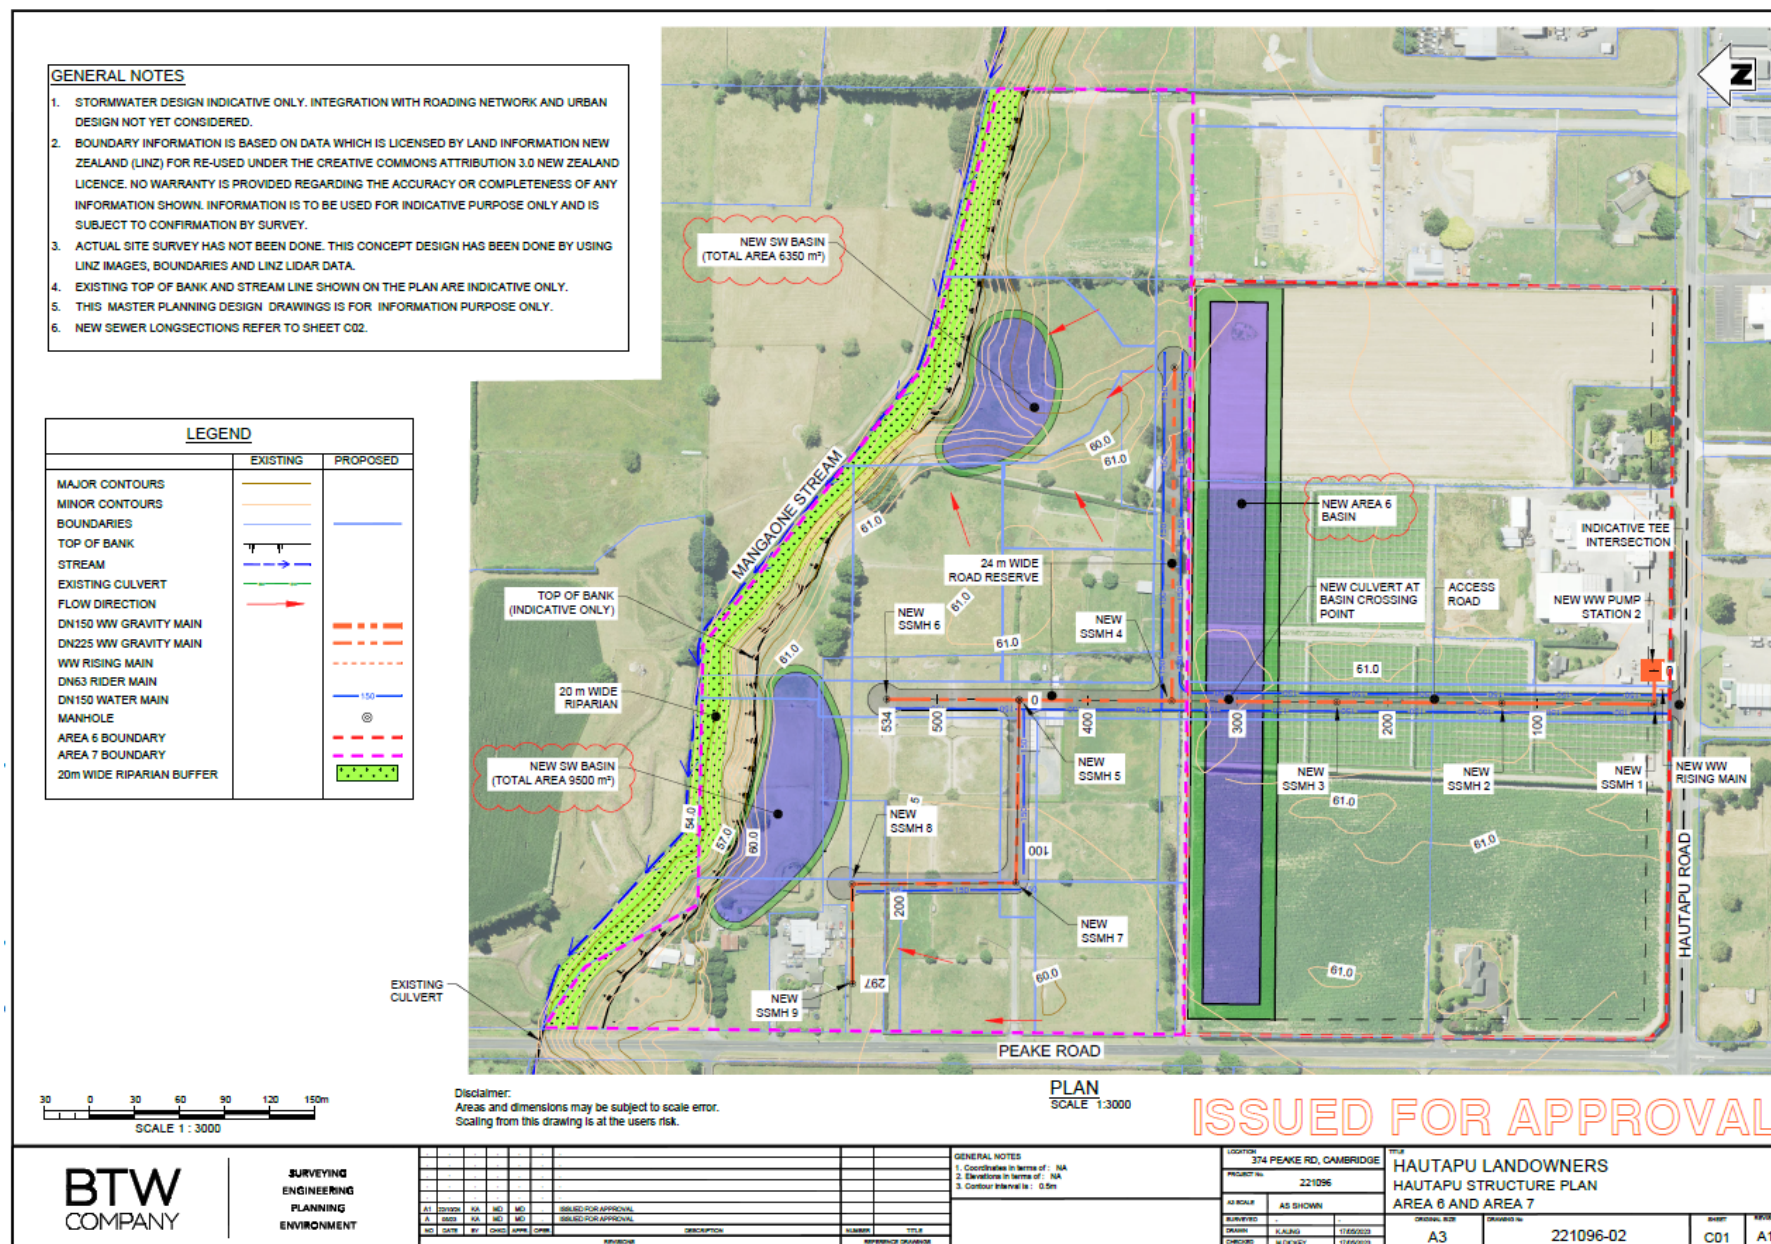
Proposed Hautapu Structure Plan for Area 6 and Area 7
